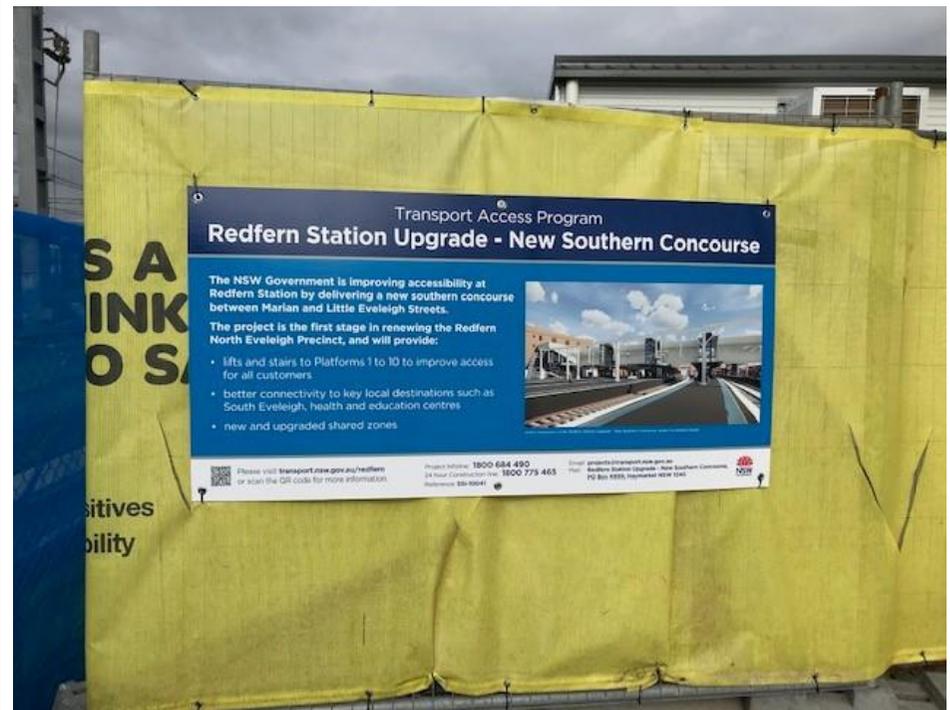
Sydney Trains Carpark – Ancillary Facility No. 2 - Project Signage was installed at the entrance of the site compound.
